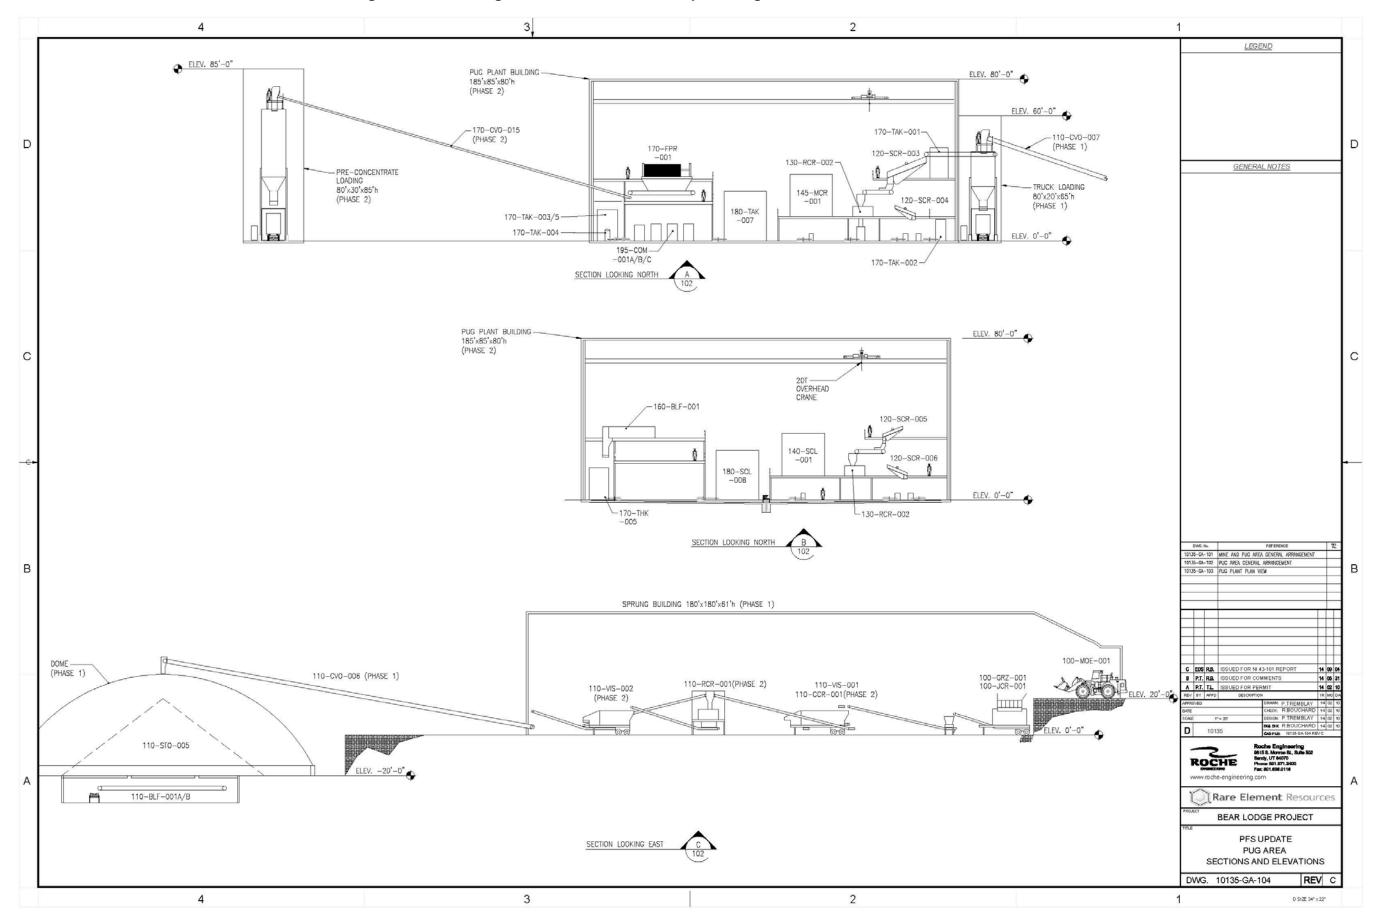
Drawing No. 10135-GA-104 - PFS Update Pug Area Sections and Elevations
